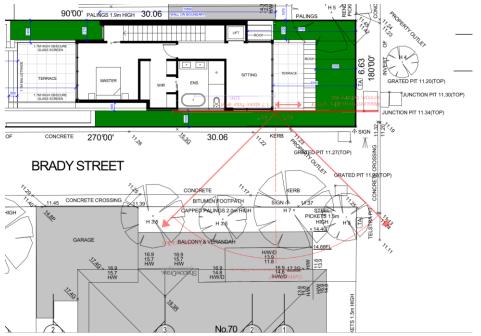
9m 'cone of vision' from the southern perimeter of the east-facing second floor terrace.
